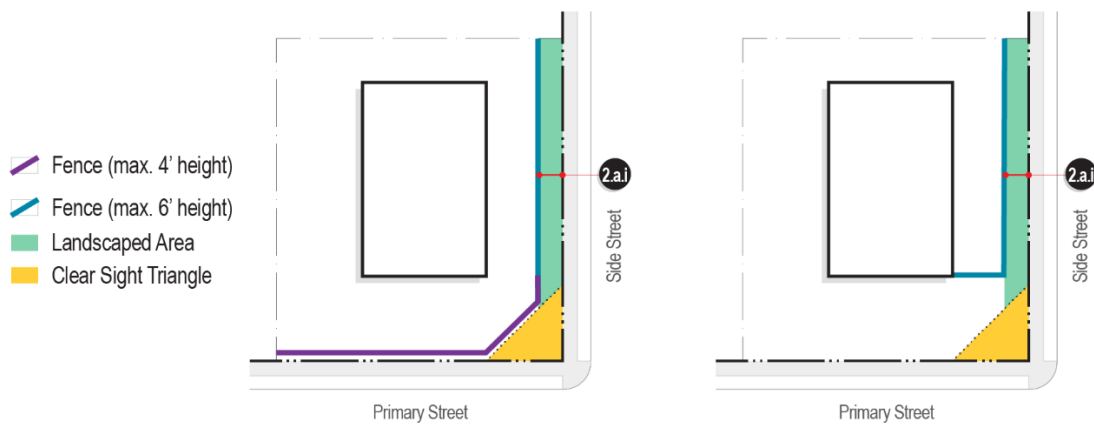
Front and Exterior Side Yard Fence Location on Lots With Single-Family Detached, Duplex, or Townhouses
